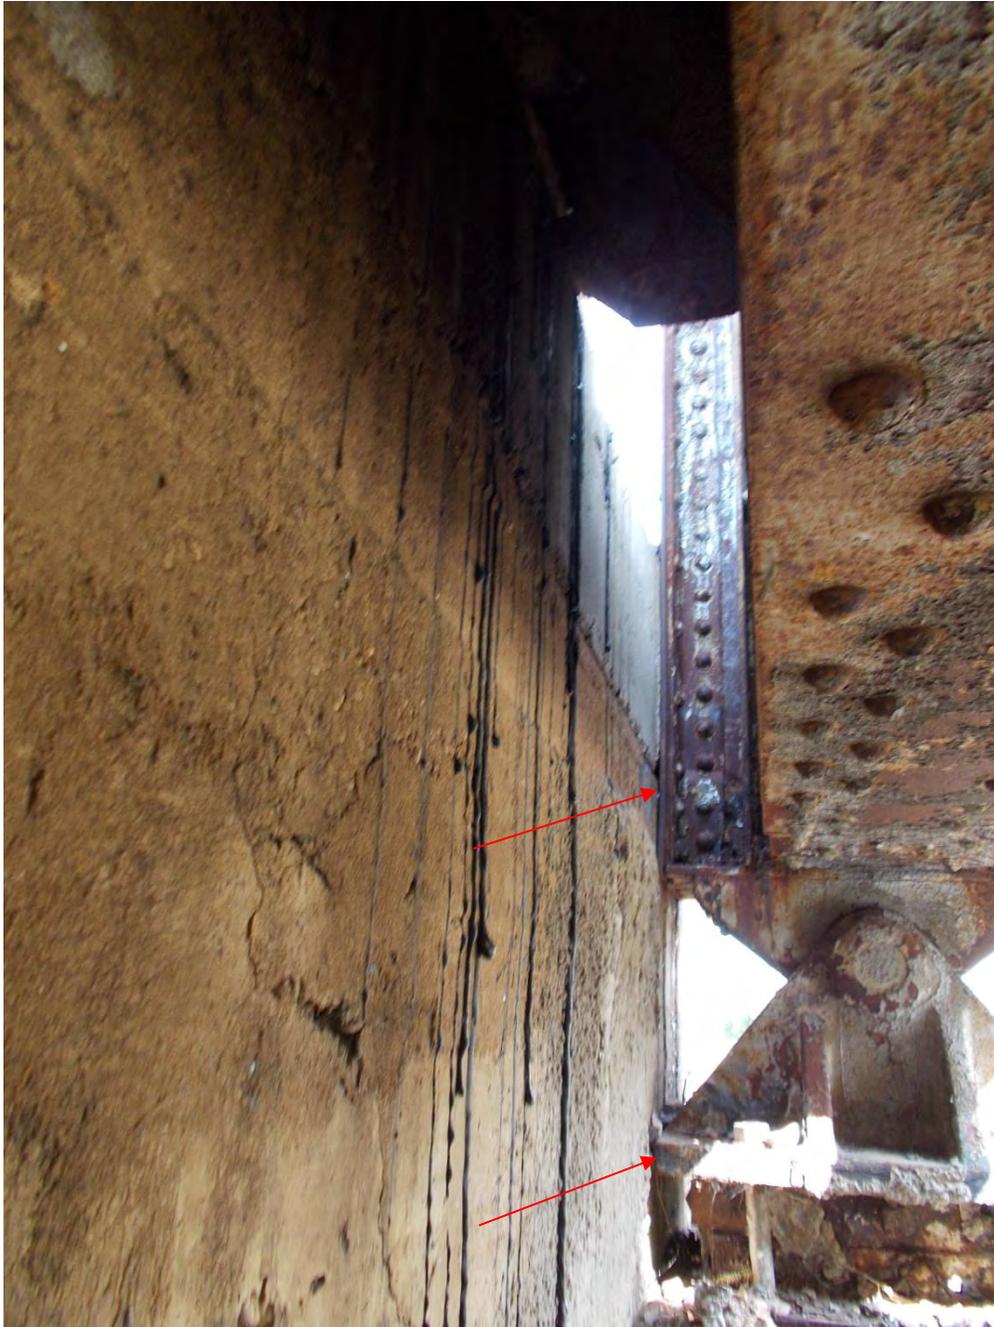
Impact Damage to Bottom Flange Cover Plates; North Girder
